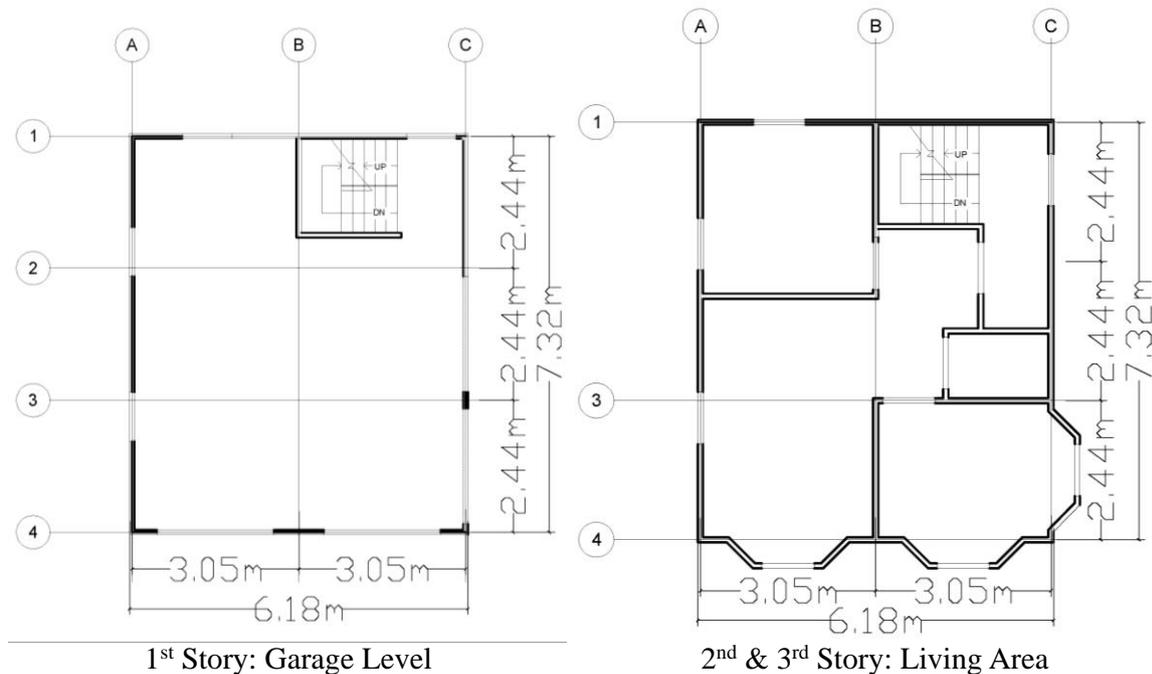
Floor plan for the three-story residential structure with first story parking garage (van de Lindt et al., 2013).
